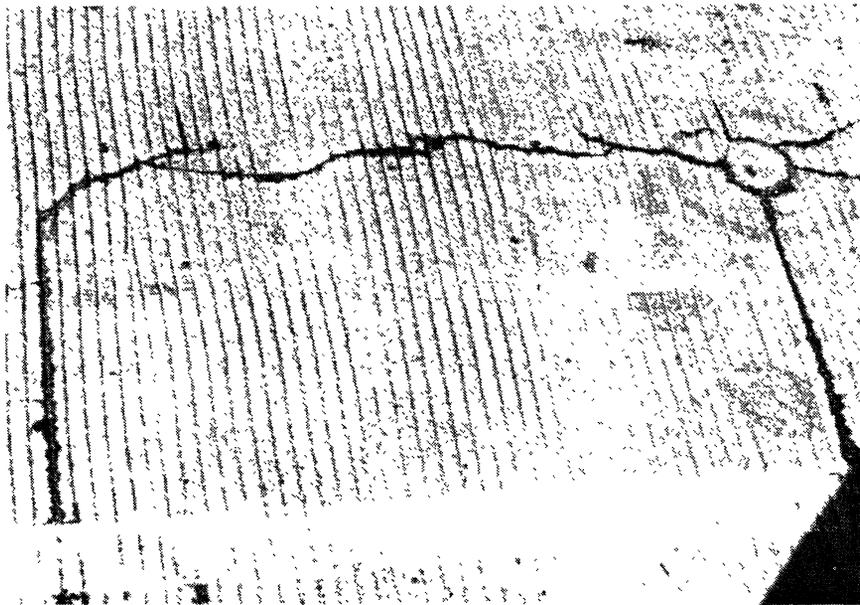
Cracks in PMPCO installation 1 caused by use of polymer concrete for Type B patching. The cracks in the overlay follow the perimeter of the patch. Similar cracks were noted in 1987 when polyester styrene concrete was used for Type B patching on Rte. 360 over the Dan River in Halifax County.
